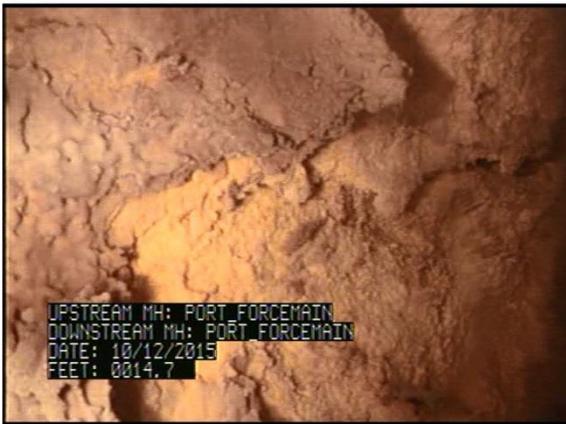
Port Force Main- typical thick layer of FOG at pipe crown
